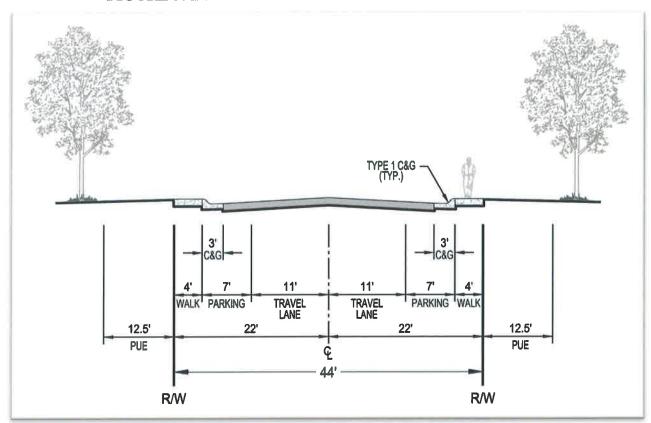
INTERNAL ROADWAY CROSS SECTION
